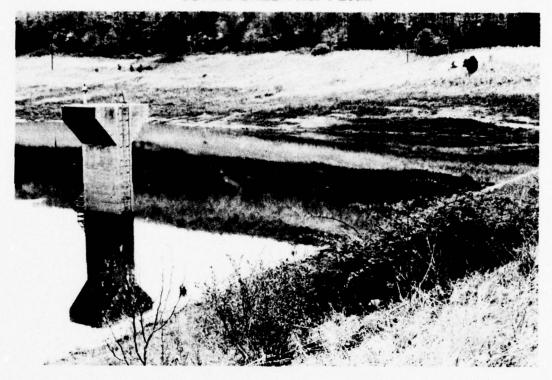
View of Left Reservoir Area from Upstream Embankment
